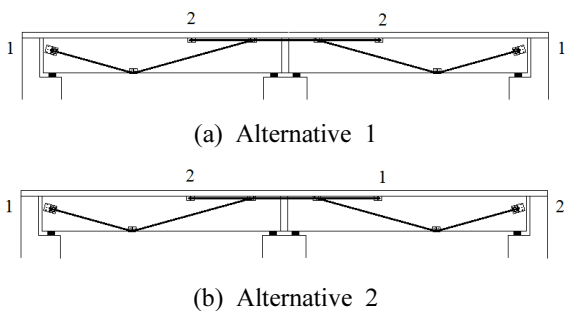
Arrangement of external tendons for strengthening of a continuous bridge (proposed system)
